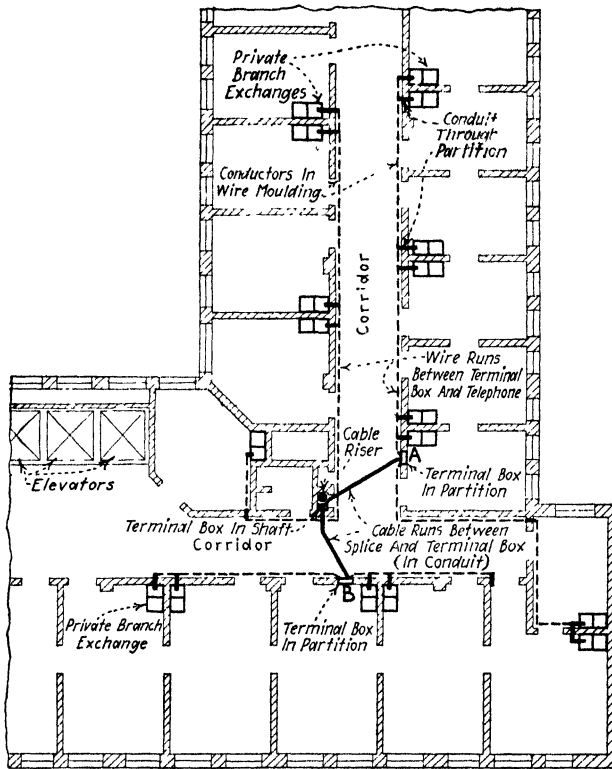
Partial floor plan of office building showing arrangement of telephone wiring (this is the same building as is shown in Fig. 641).
